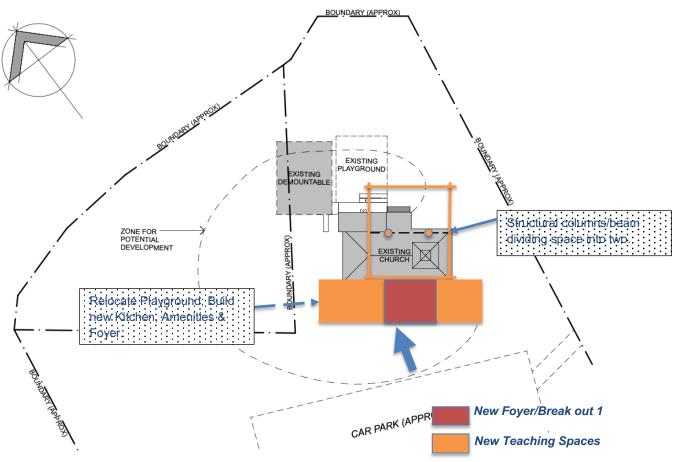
Sketch of Potential Retention & Refurbishment of Existing Chapel
